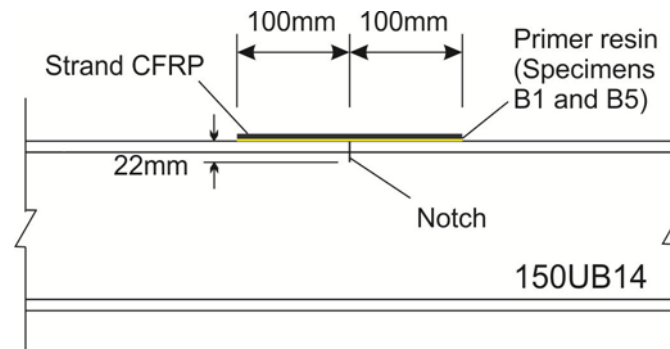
Details of strand CFRP sheets bonded to the notched beam
